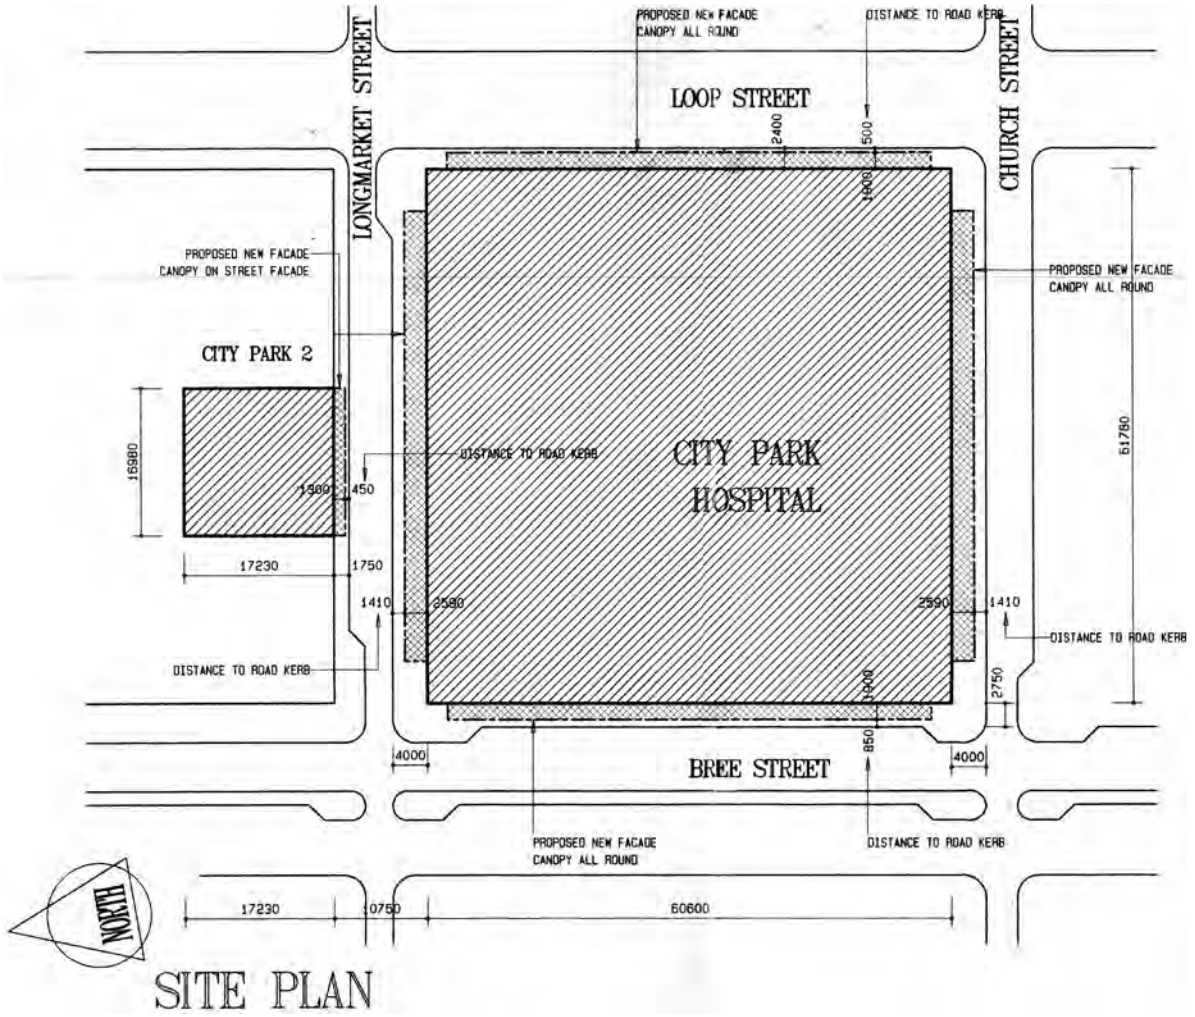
Site plan drawn in 1998 by the architectural firm Brink Stokes Marais & Moolman
